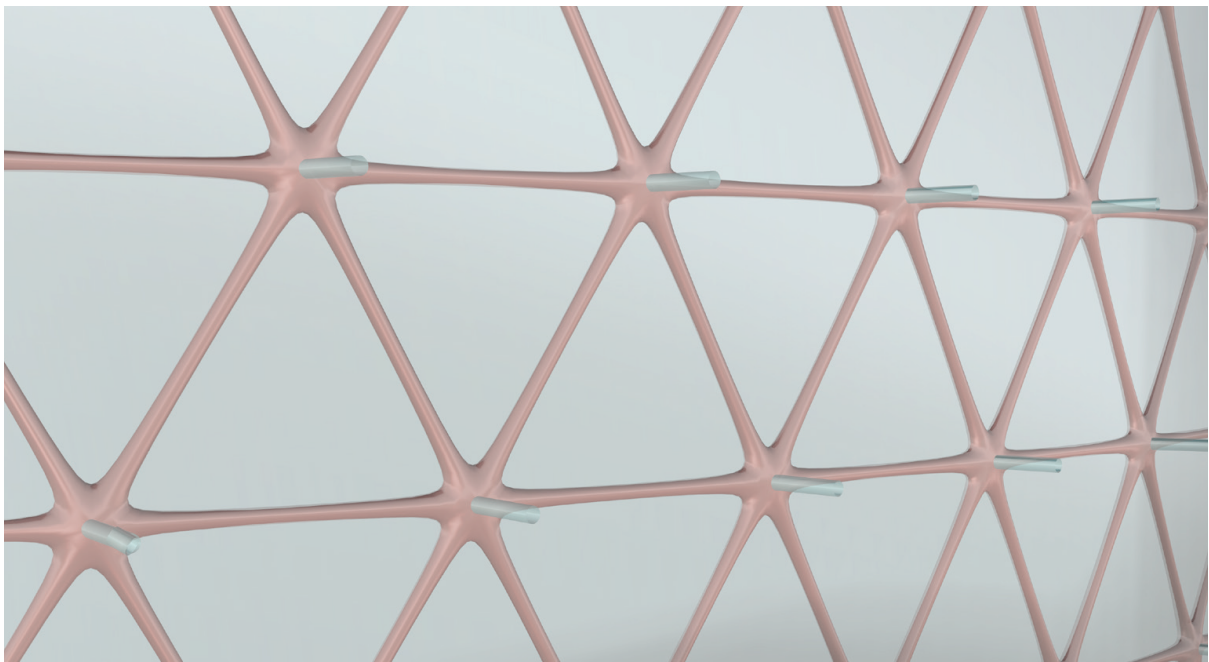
Connection between Structure and Sub- Structure (Stainless steel) installed on TRIO 's facade..
